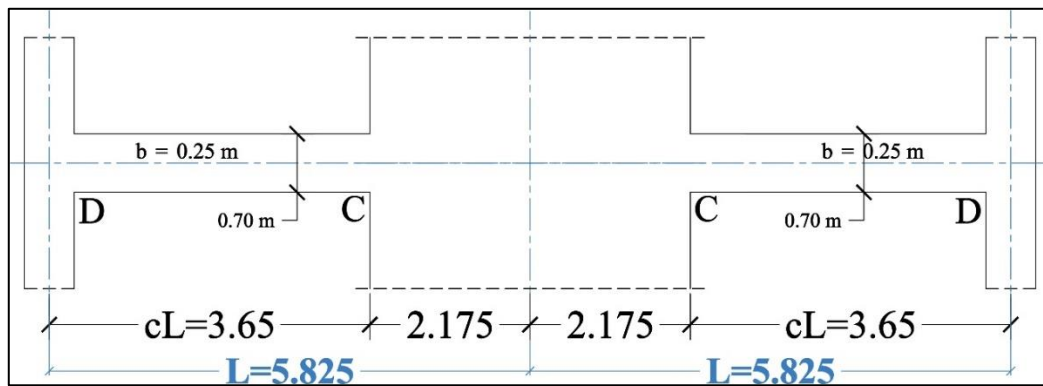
Coupled Beams Connected Between Core Wall and Column (Y-Dir.).
